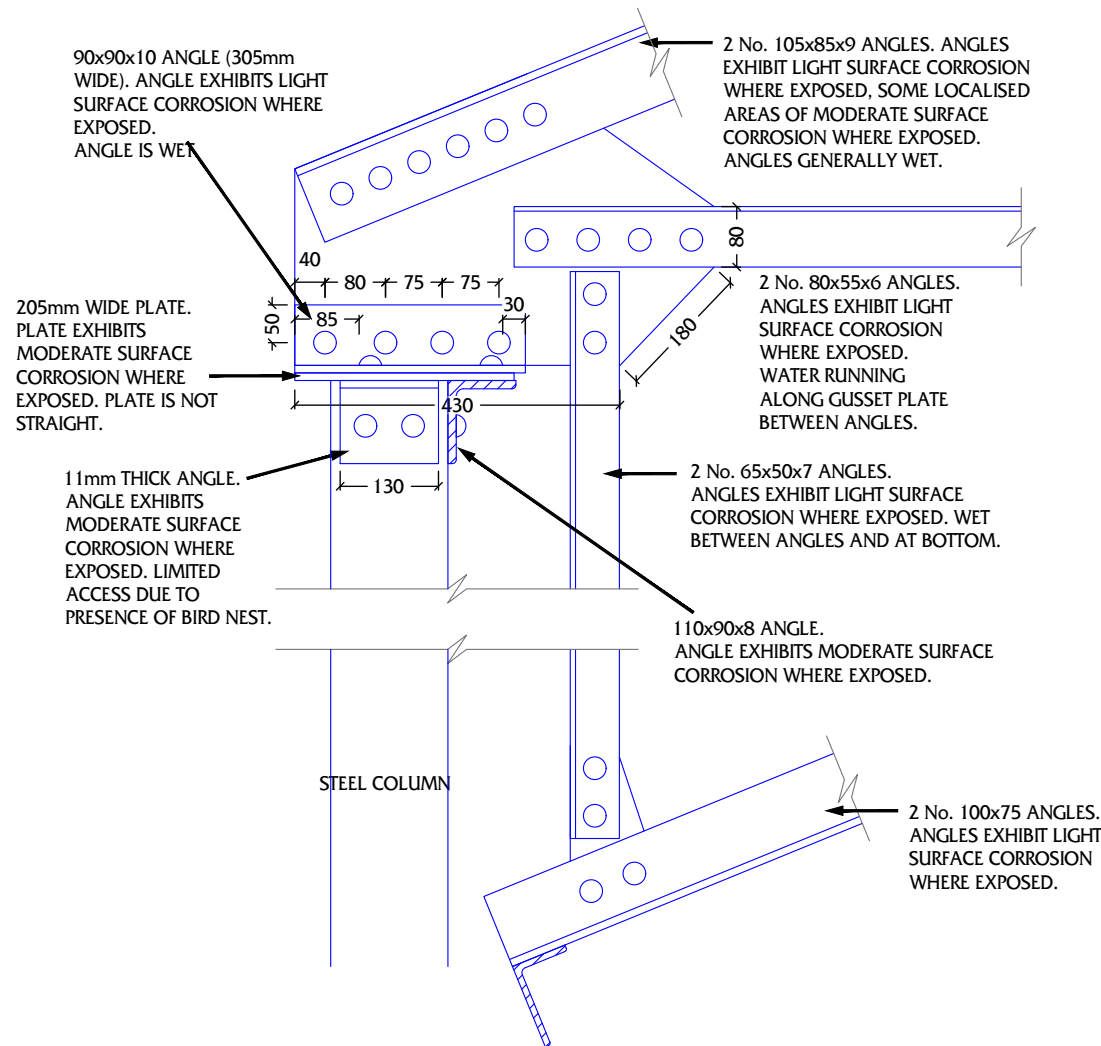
PART ELEVATION LOOKING SOUTH SHOWING DETAILS OF PARTIALLY EXPOSED ROOF TRUSS END CONNECTION - SURVEY AREA E10 SCALE 1:10
